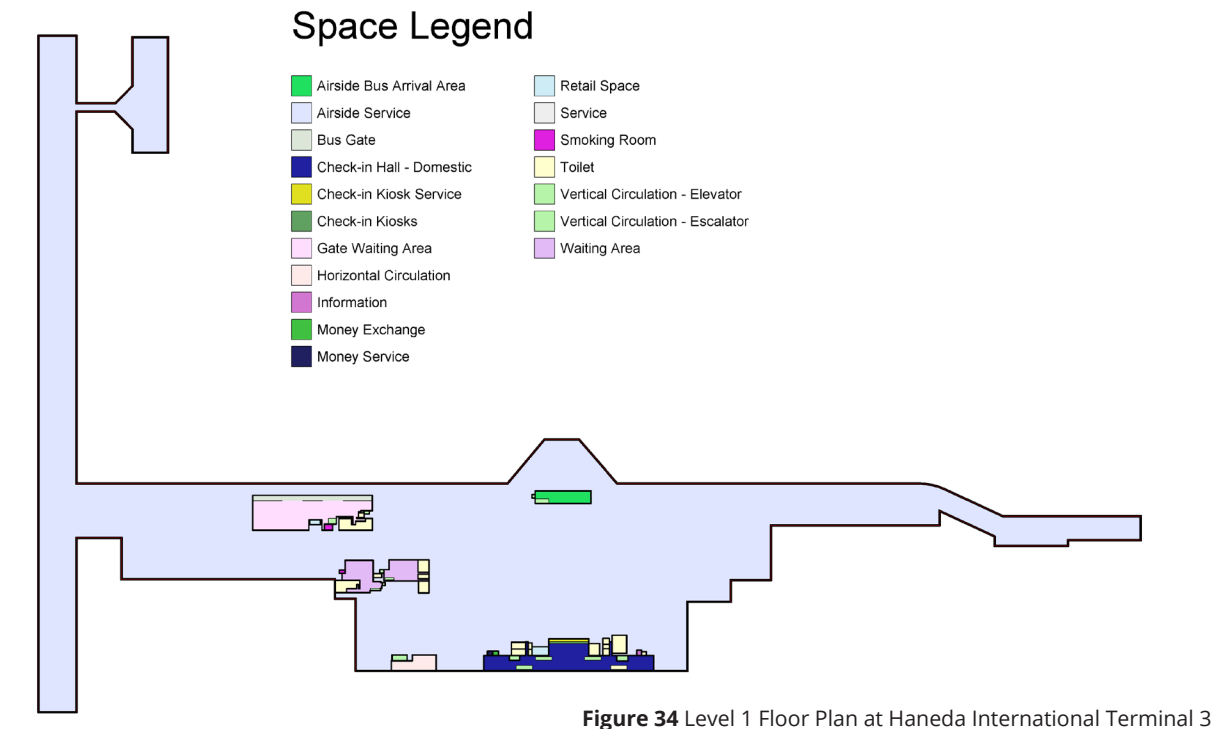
Level 1 Floor Plan at Haneda International Terminal 3
